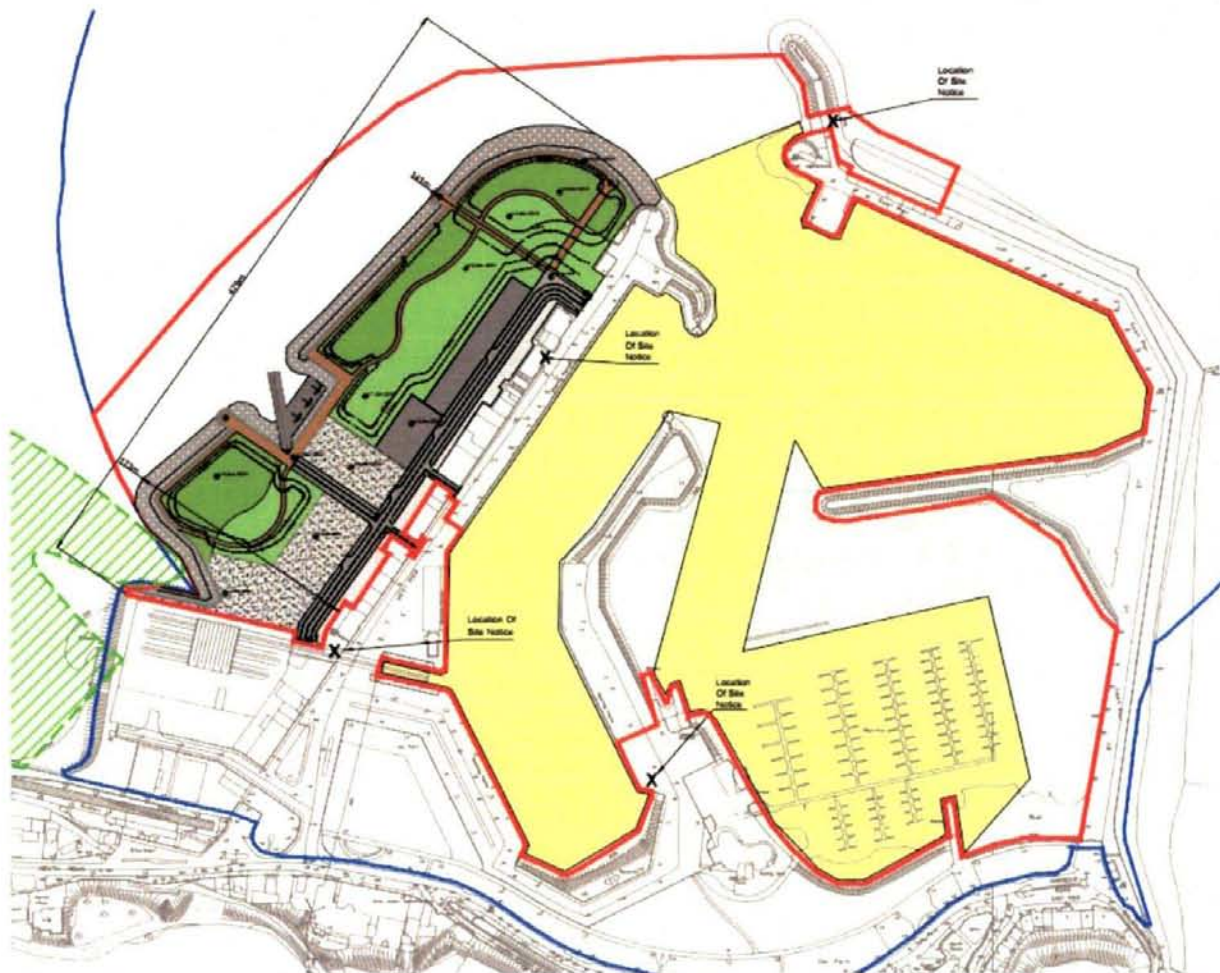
Extract from Project Drawing showing the proposed reclamation area west of the West Pier and the dredge area in yellow. Drawing no. 19934-5002 Site Layout Plan.
